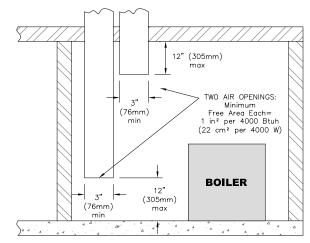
Air Openings – All Air from Outdoors through Vertical Ducts
